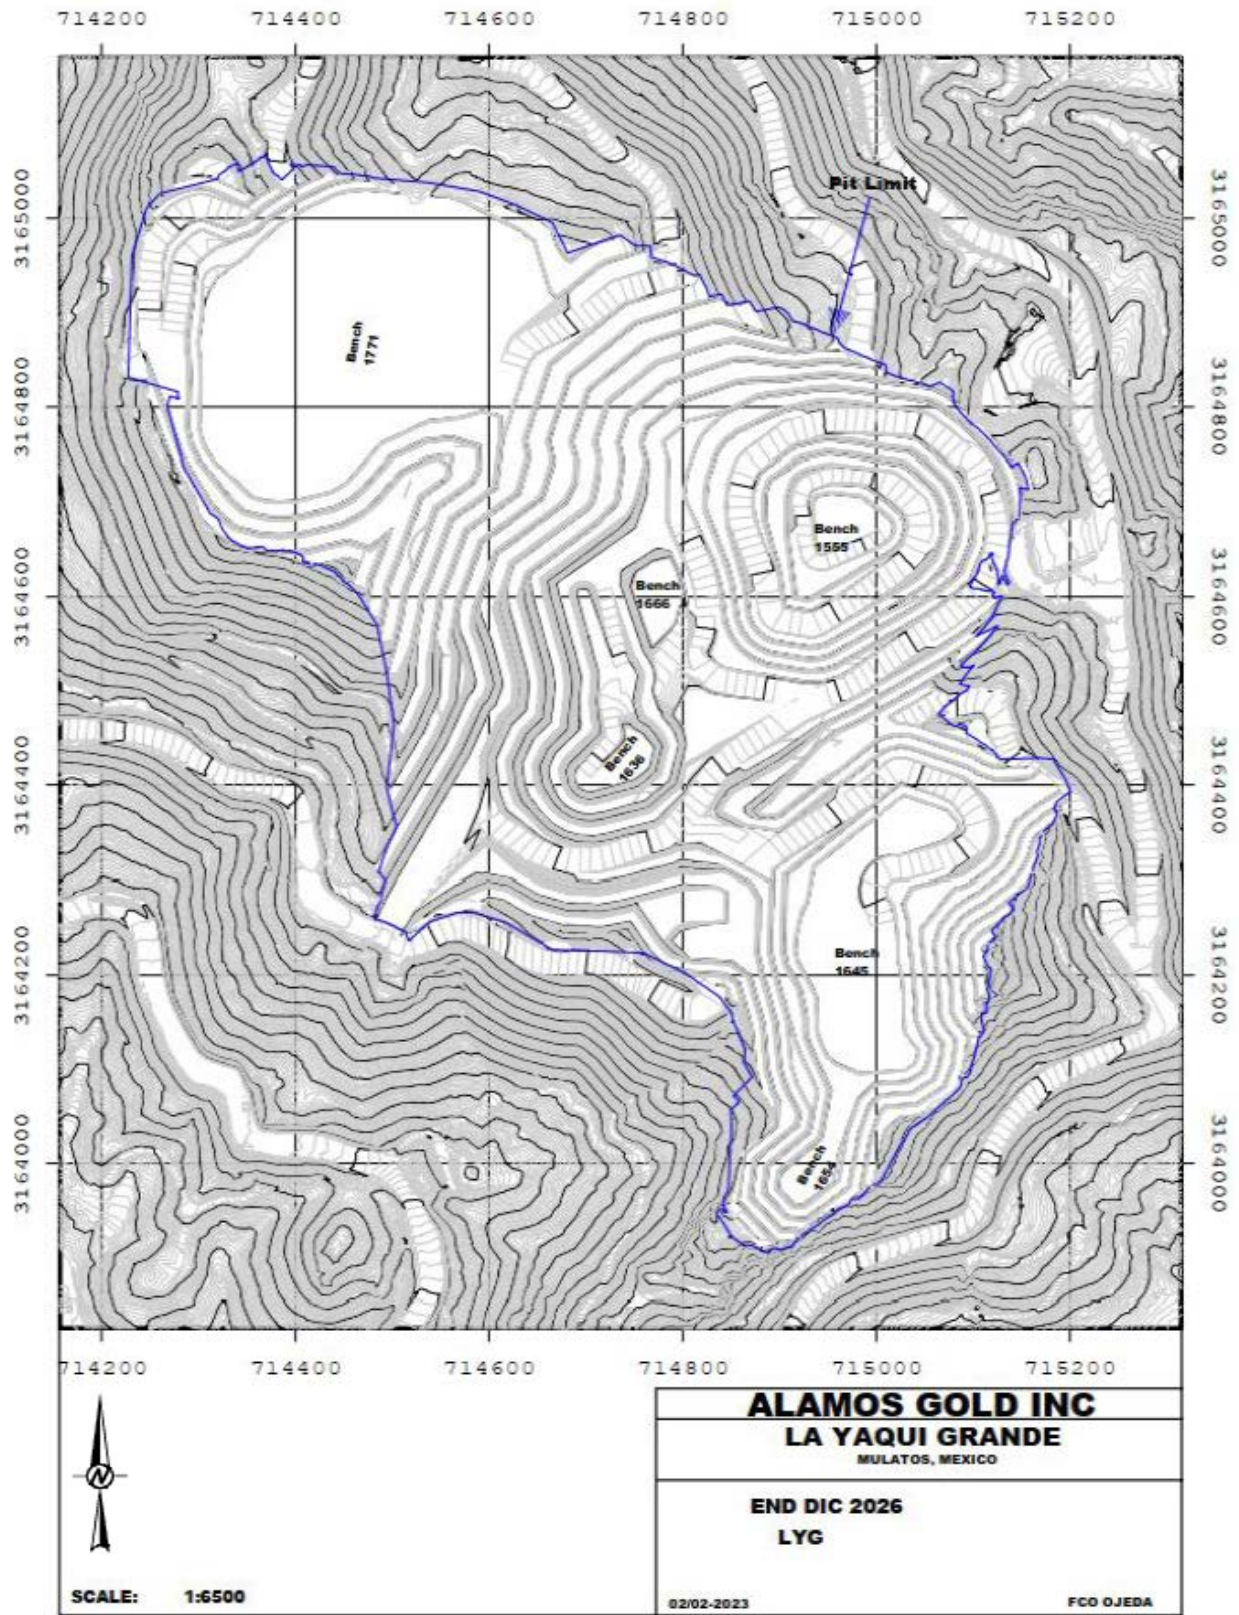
La Yaqui Grande Pit Plan, End of 2026
